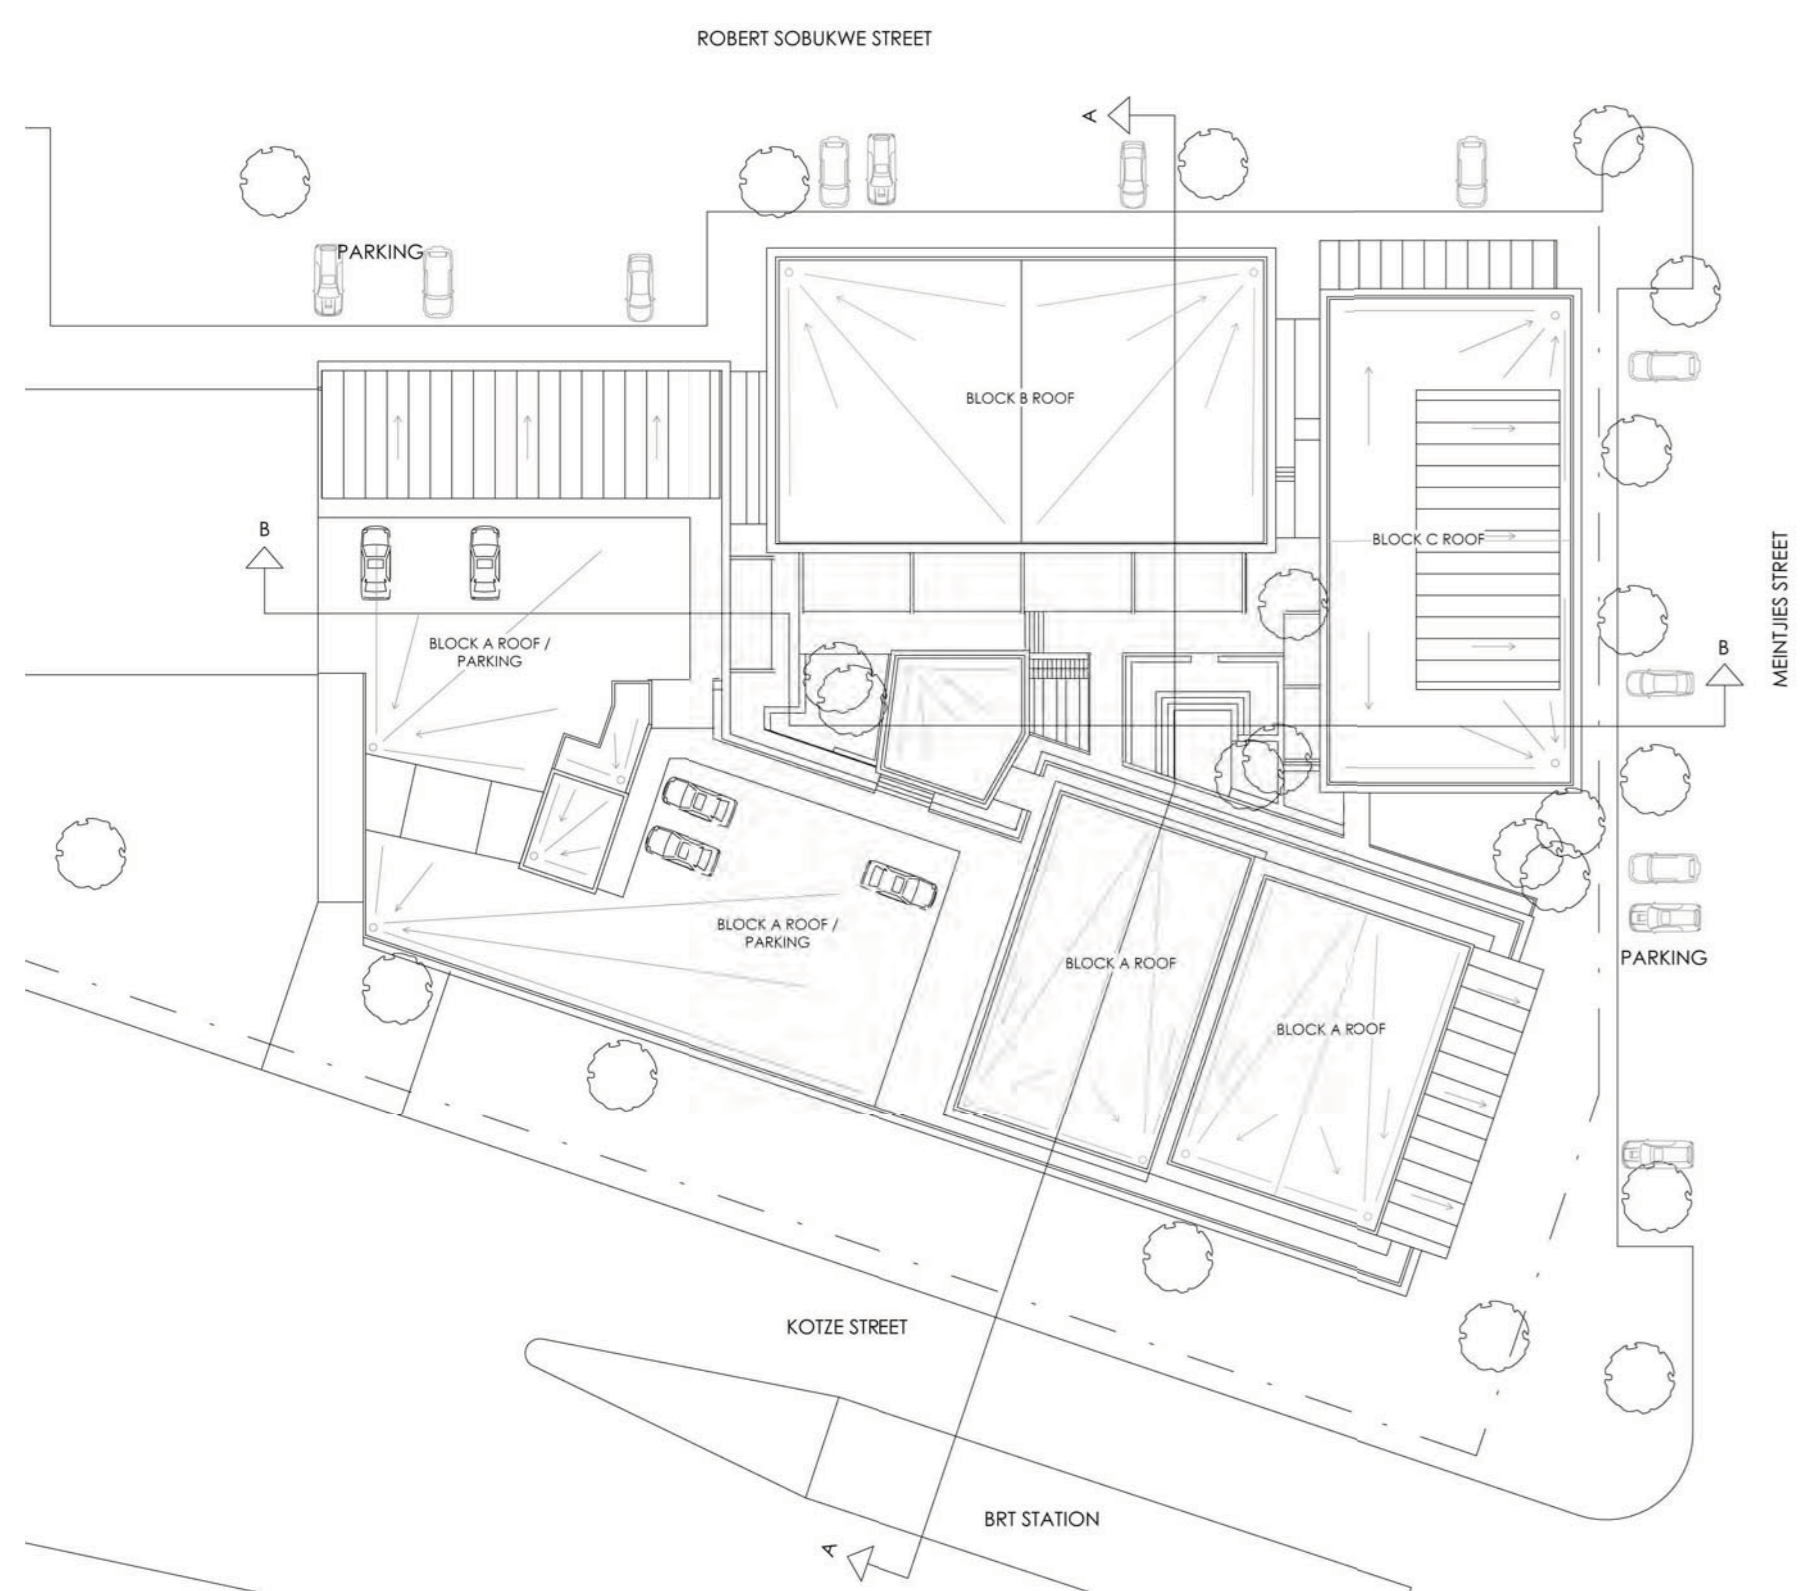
Additions Roof Plan Scale 1:500
